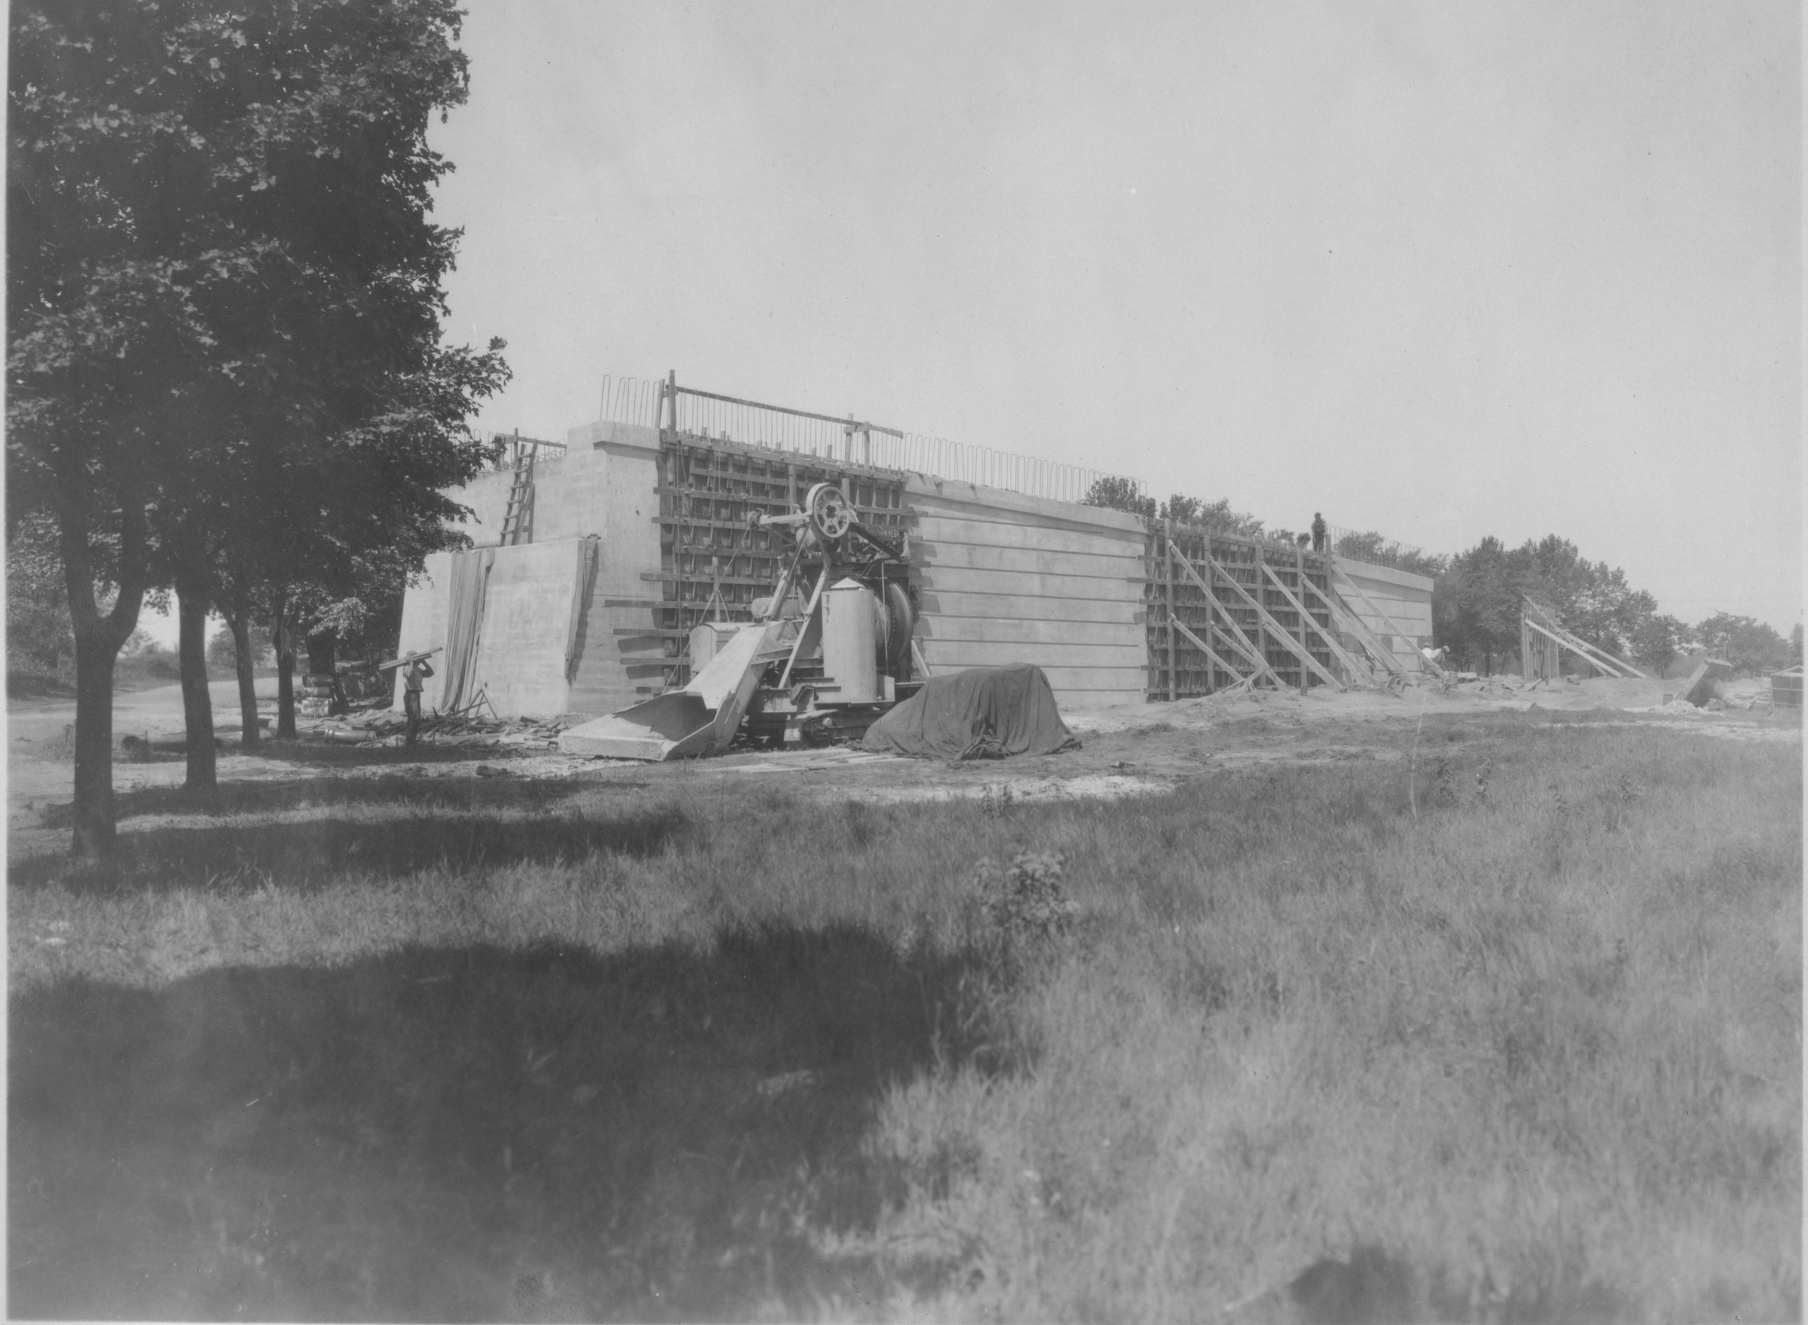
Retaining wall construction. Pennsylvania approach.
